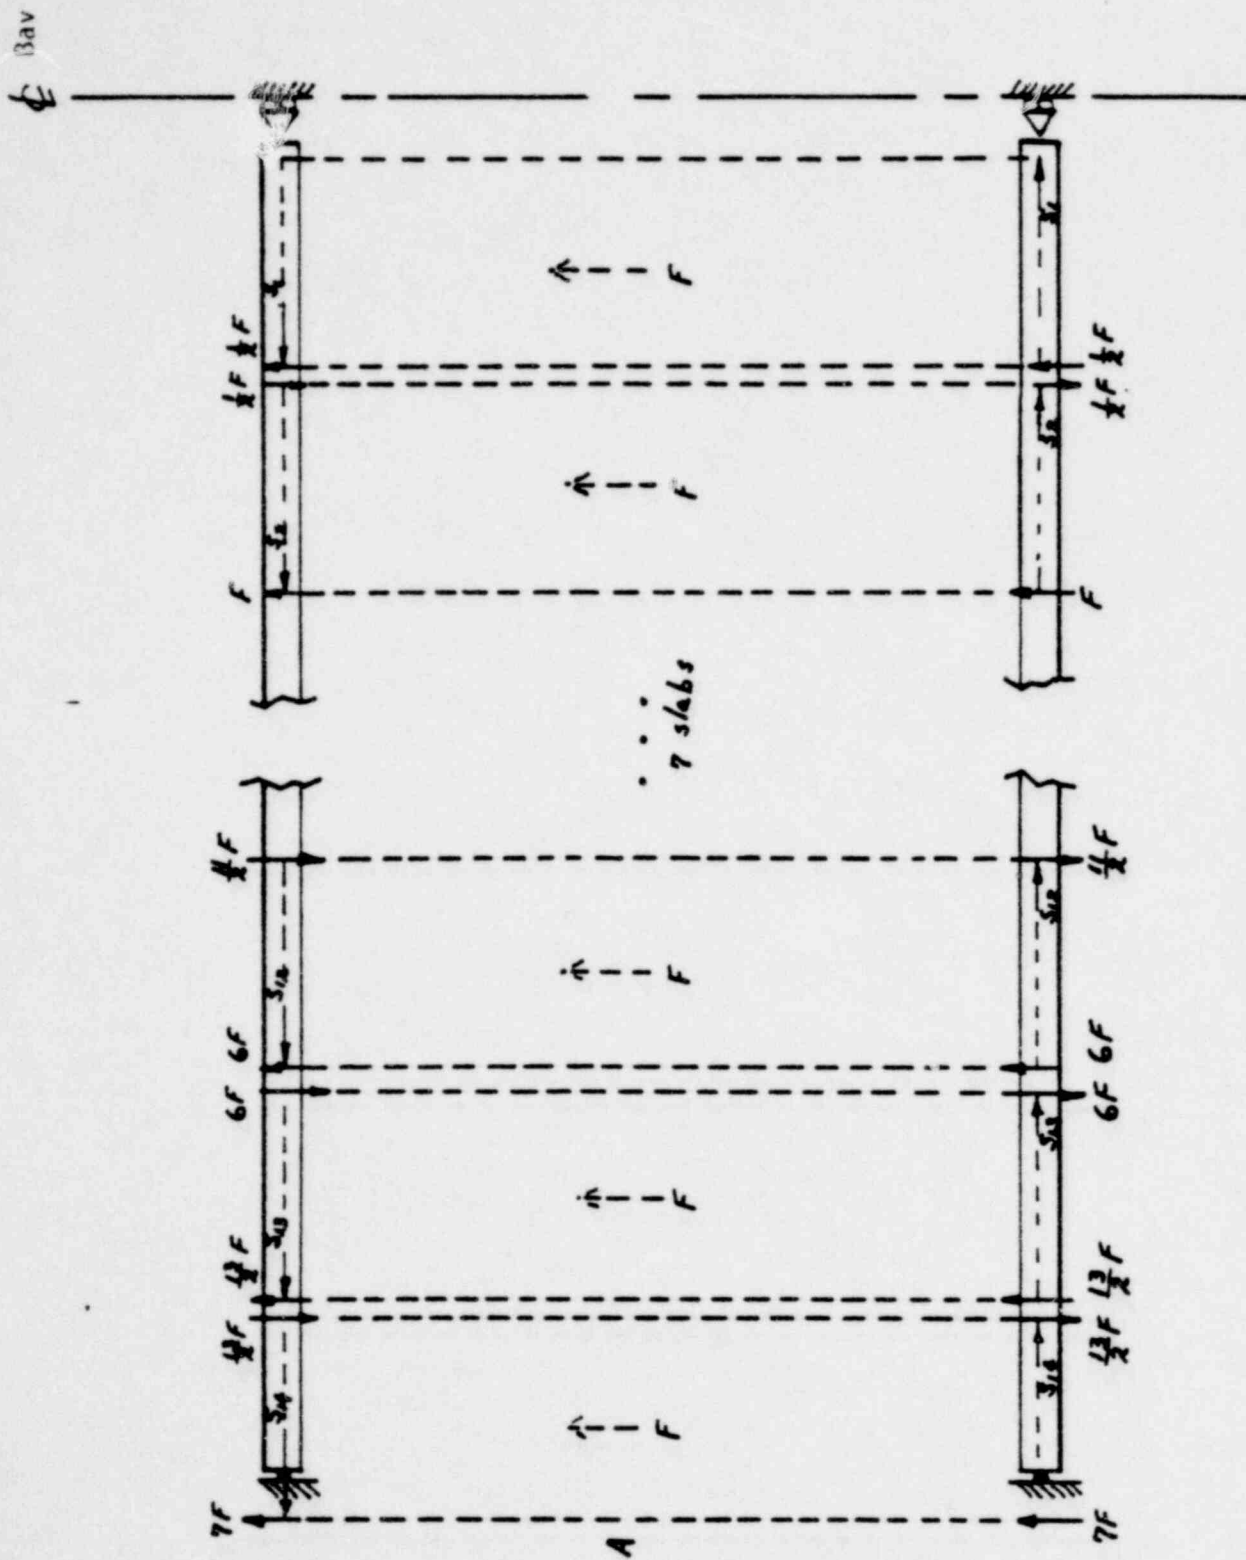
CHANNEL SLAB FORCES ON THE BEAMS
